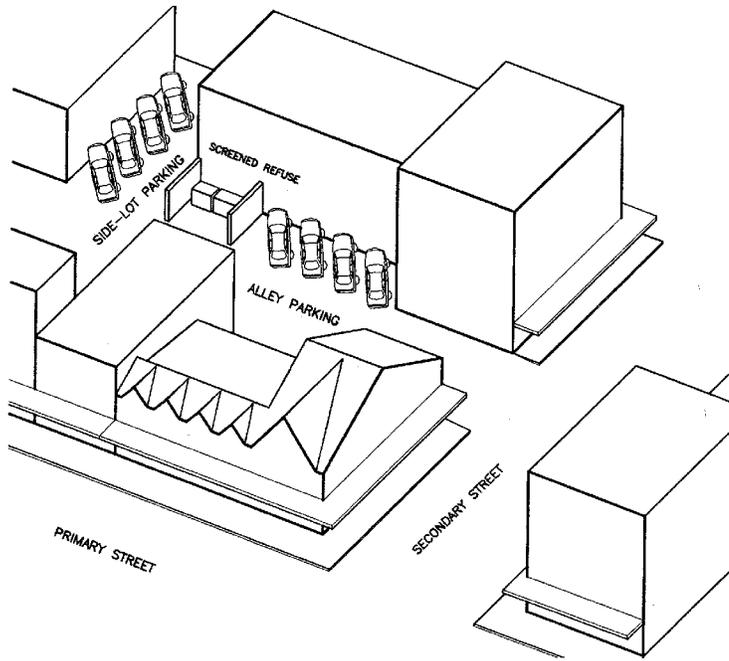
Corner massing, setbacks, building orientation, off-street parking, and screening.
